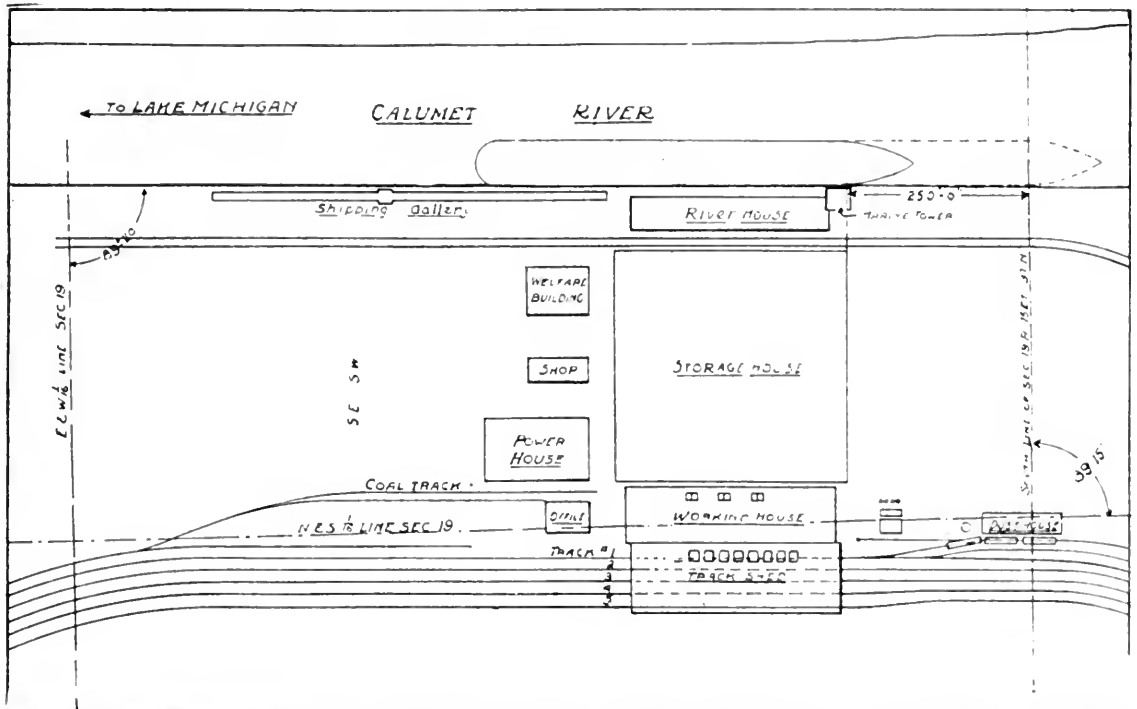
Plan showing layout of buildings and rail and water facilities of C. & N. W. Ry. Elevator.
